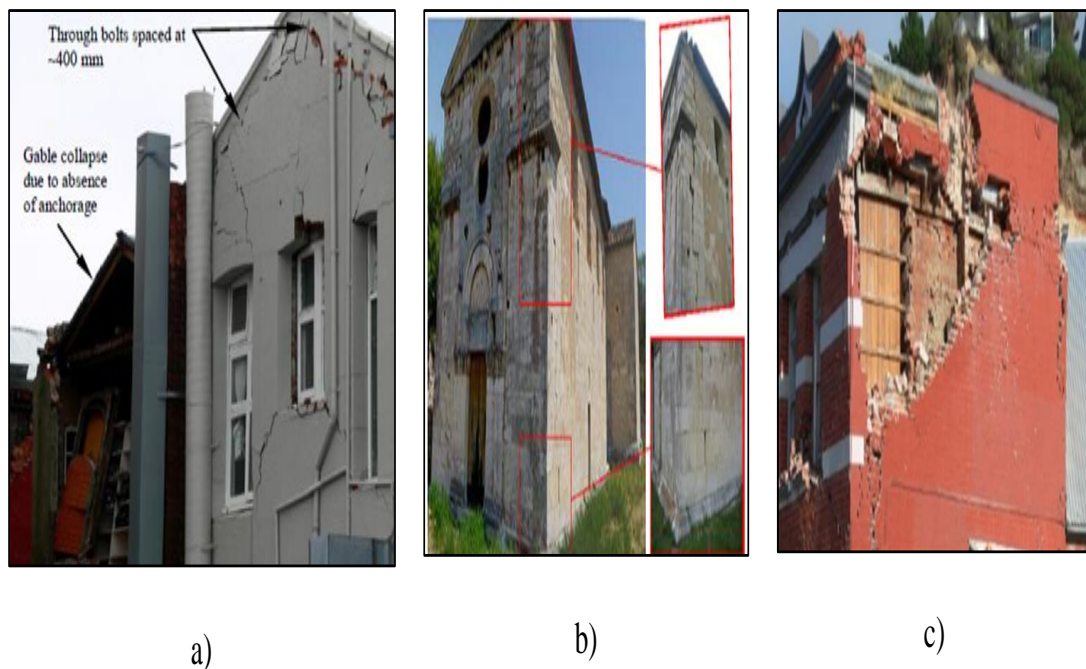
Masonry Buildings Failure: a) Gable Wall Failure, b) Vertical Crack at Corner, c) Separation of Wall [13], [14].
